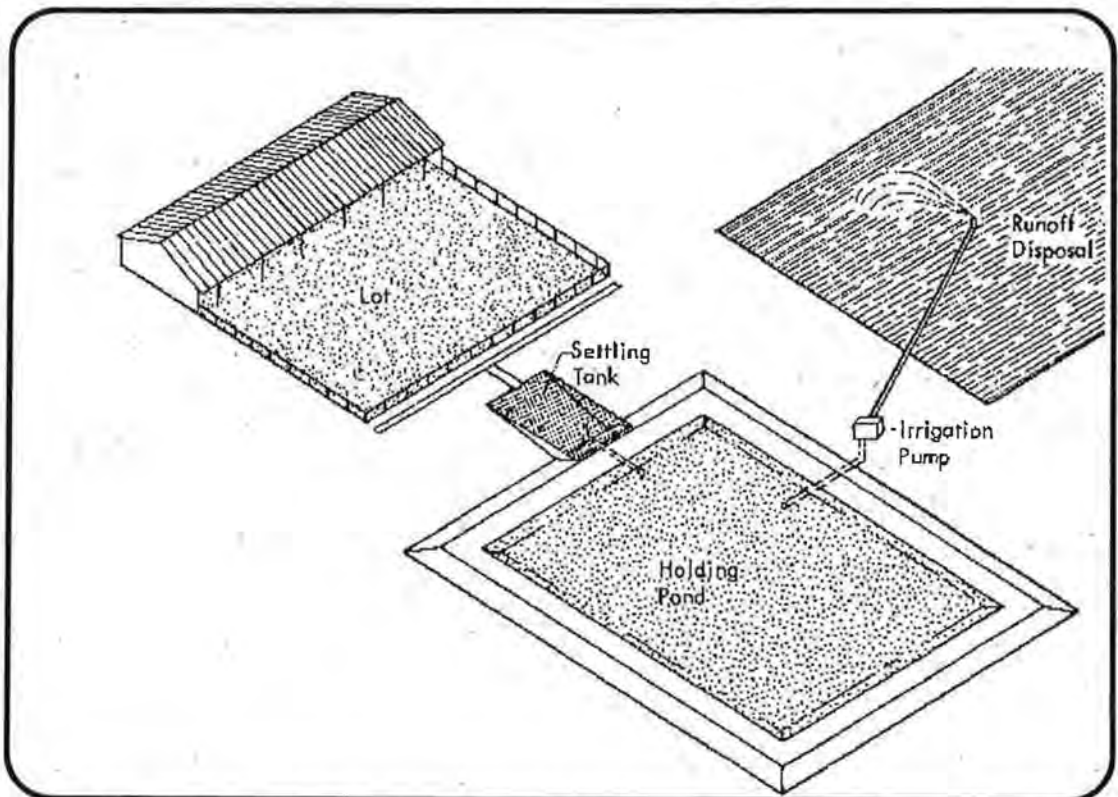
Detention pond for storage of animal lot runoff. Source: *Dairy Housing and Equipment Handbook, MWPS-7*, Midwest Plan Service, Ames, Iowa.
